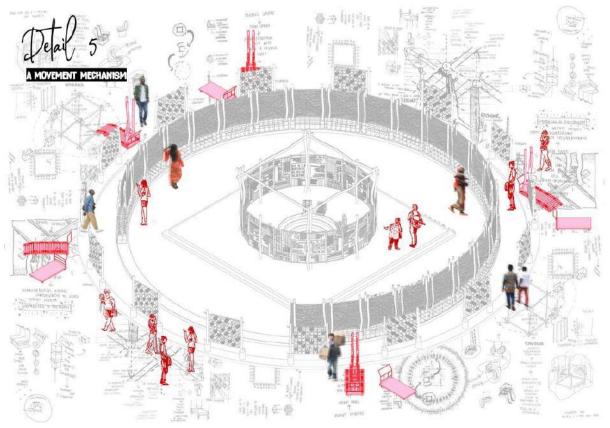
Axonometric highlighting detail 5 in place (Author, 2021).
